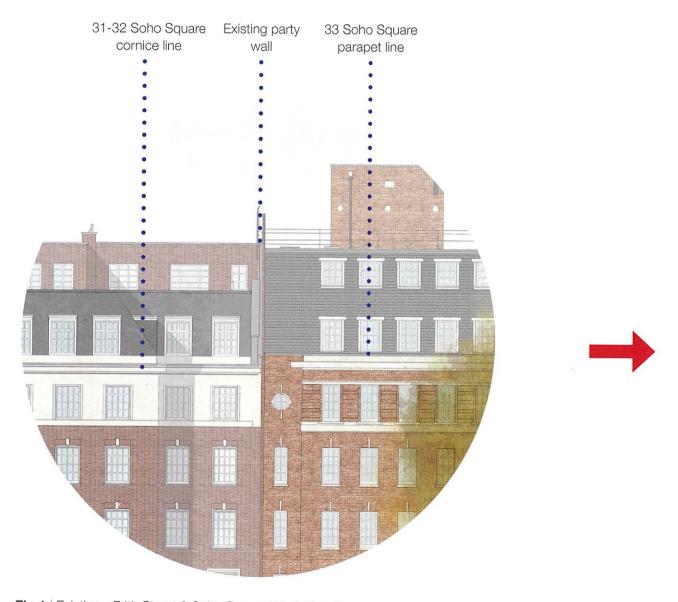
| Existing - Frith Street & Soho Square West Elevation
